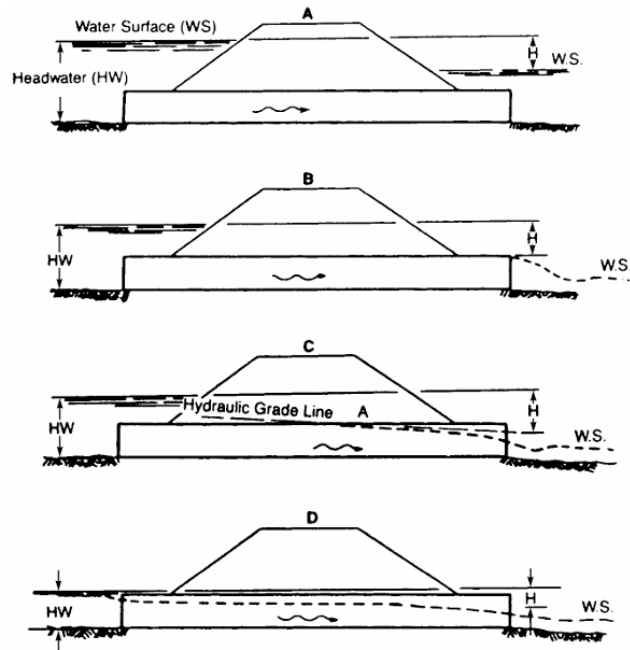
Typical of Crosectional Culvert with outlet control [24]
